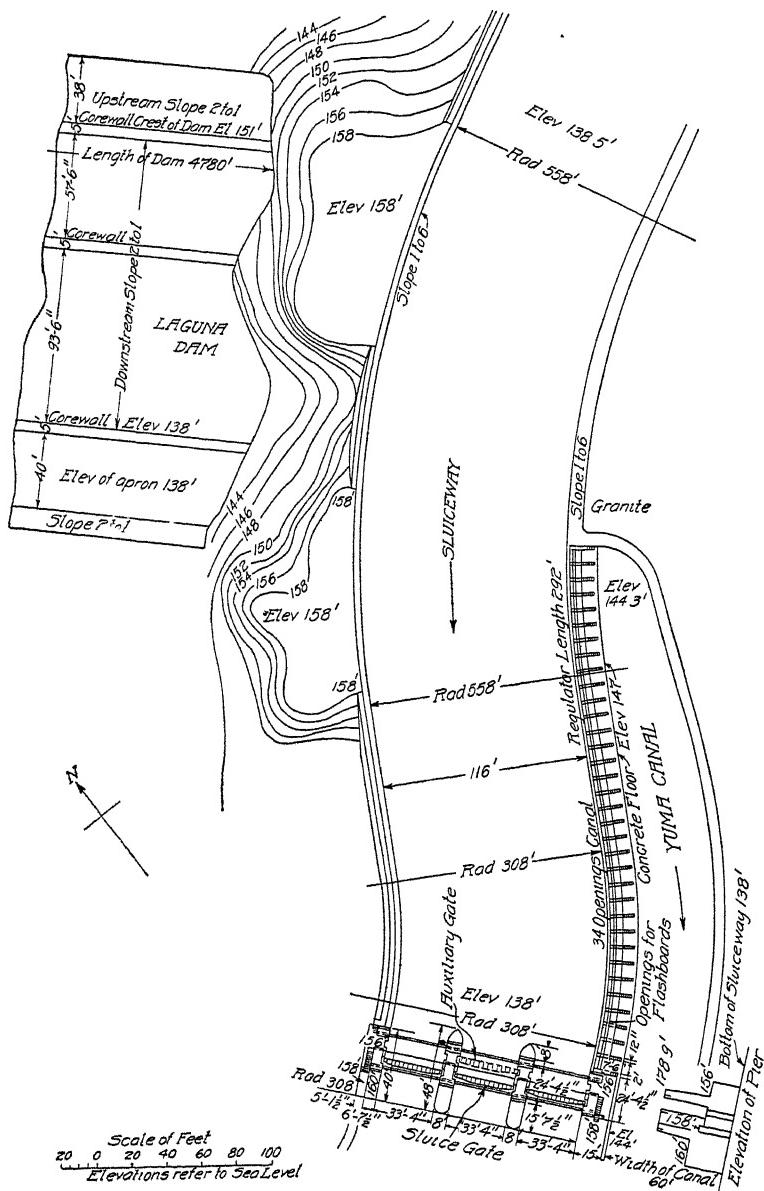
Plan of Laguna Weir-Scouring Sluices
